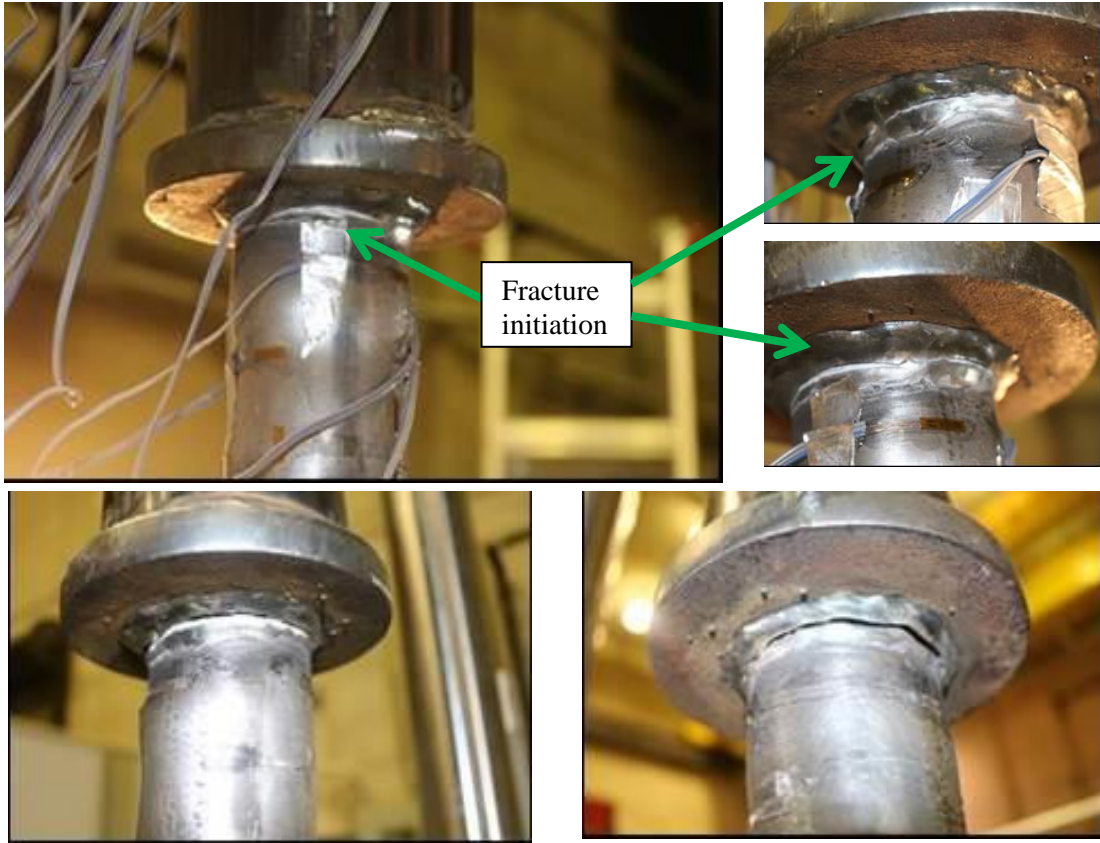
Fracture of the fillet welds of the edge tube to the fixed end
